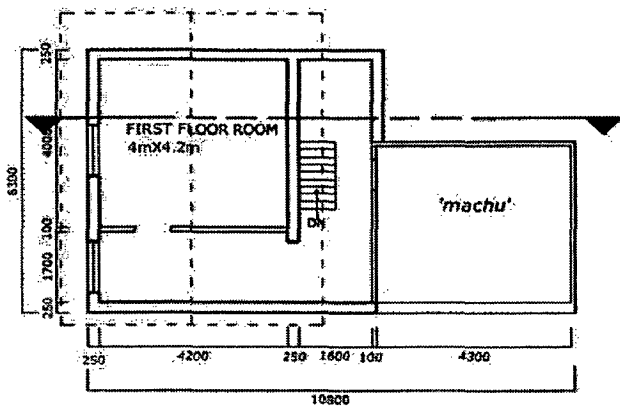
First floor plan of residence 1 in Kizhakkencherry Agraharam
